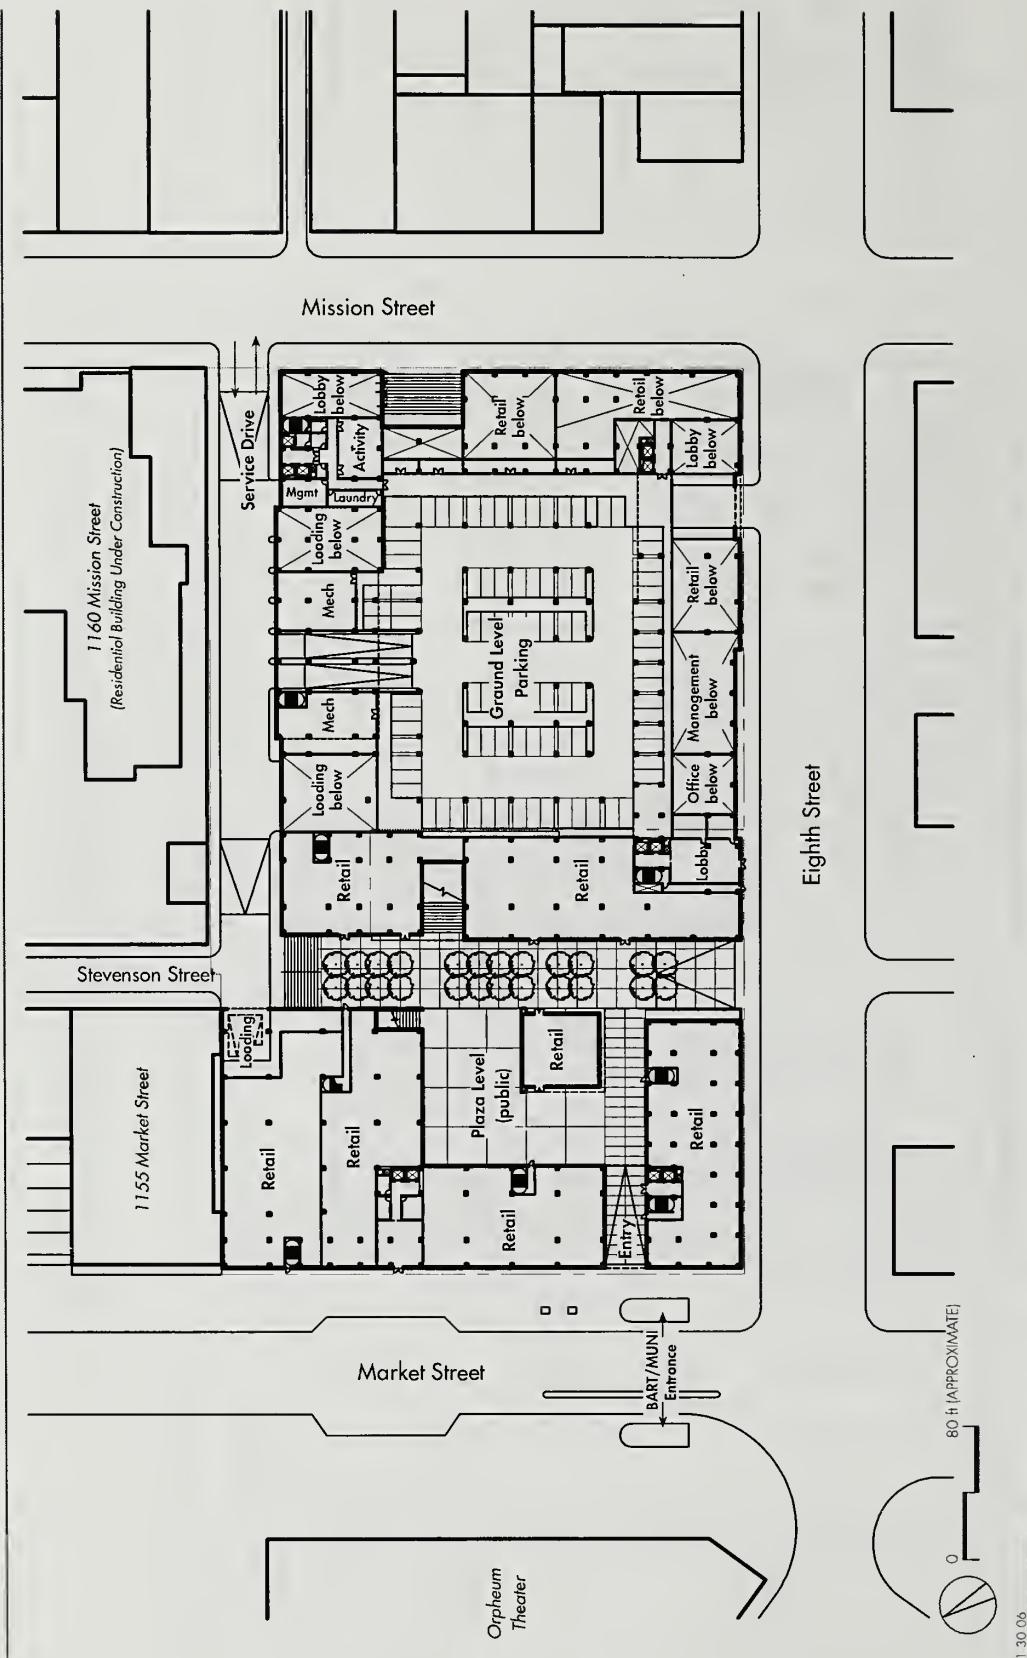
GROUND FLOOR PLAN (AT MARKET STREET GRADE)
